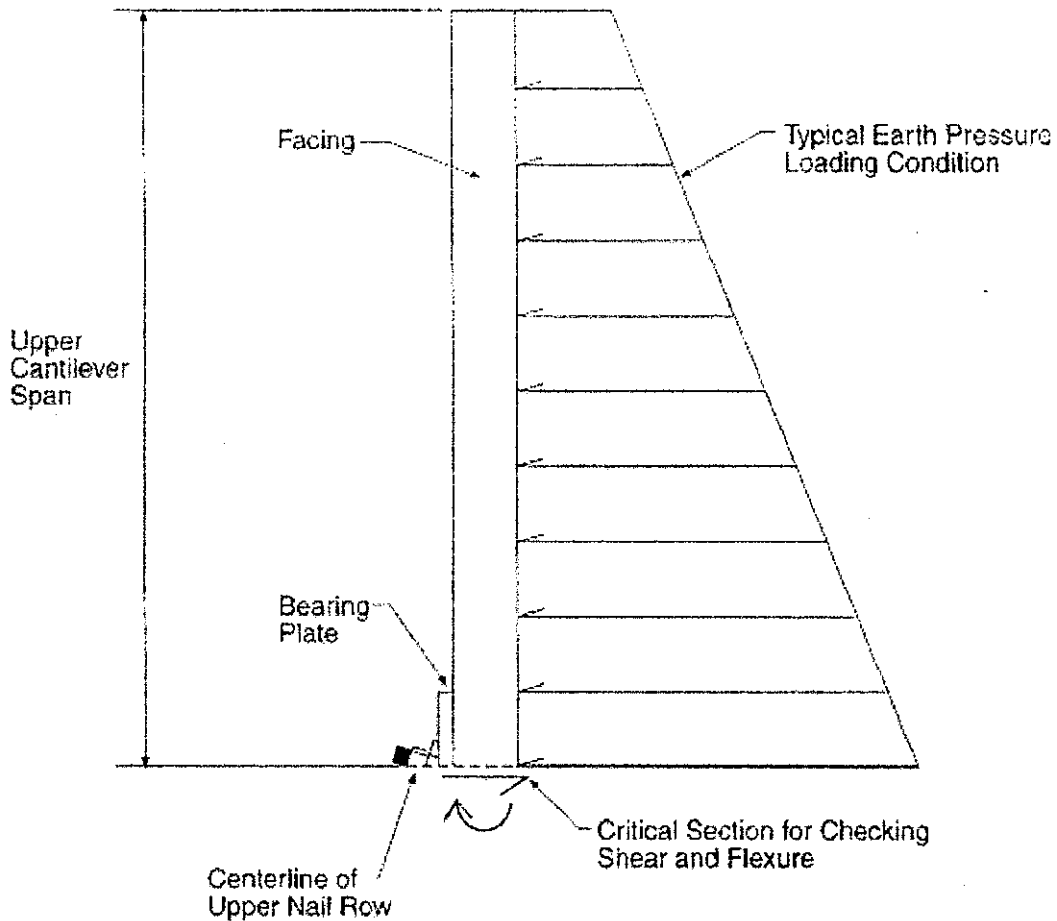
Upper Cantilever Design Check (from FHWA 1998)
